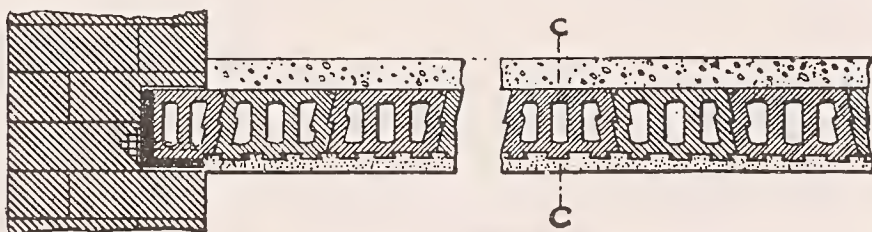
SECTION OF BUNNETT'S FLOOR.
